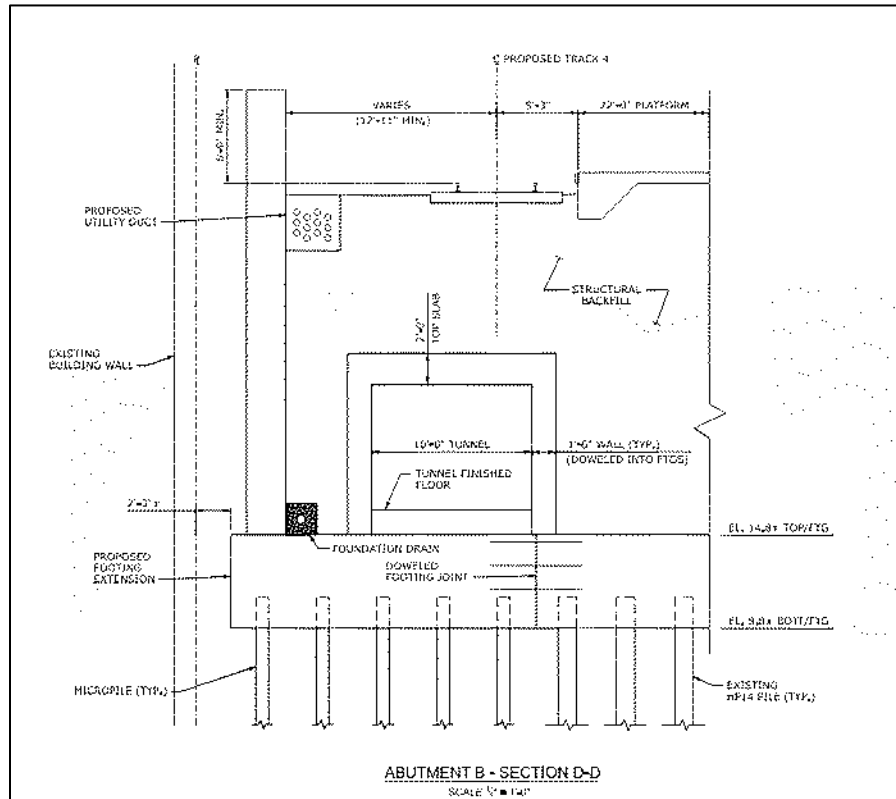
Section View through 7th Street SW Bridge North Abutment
